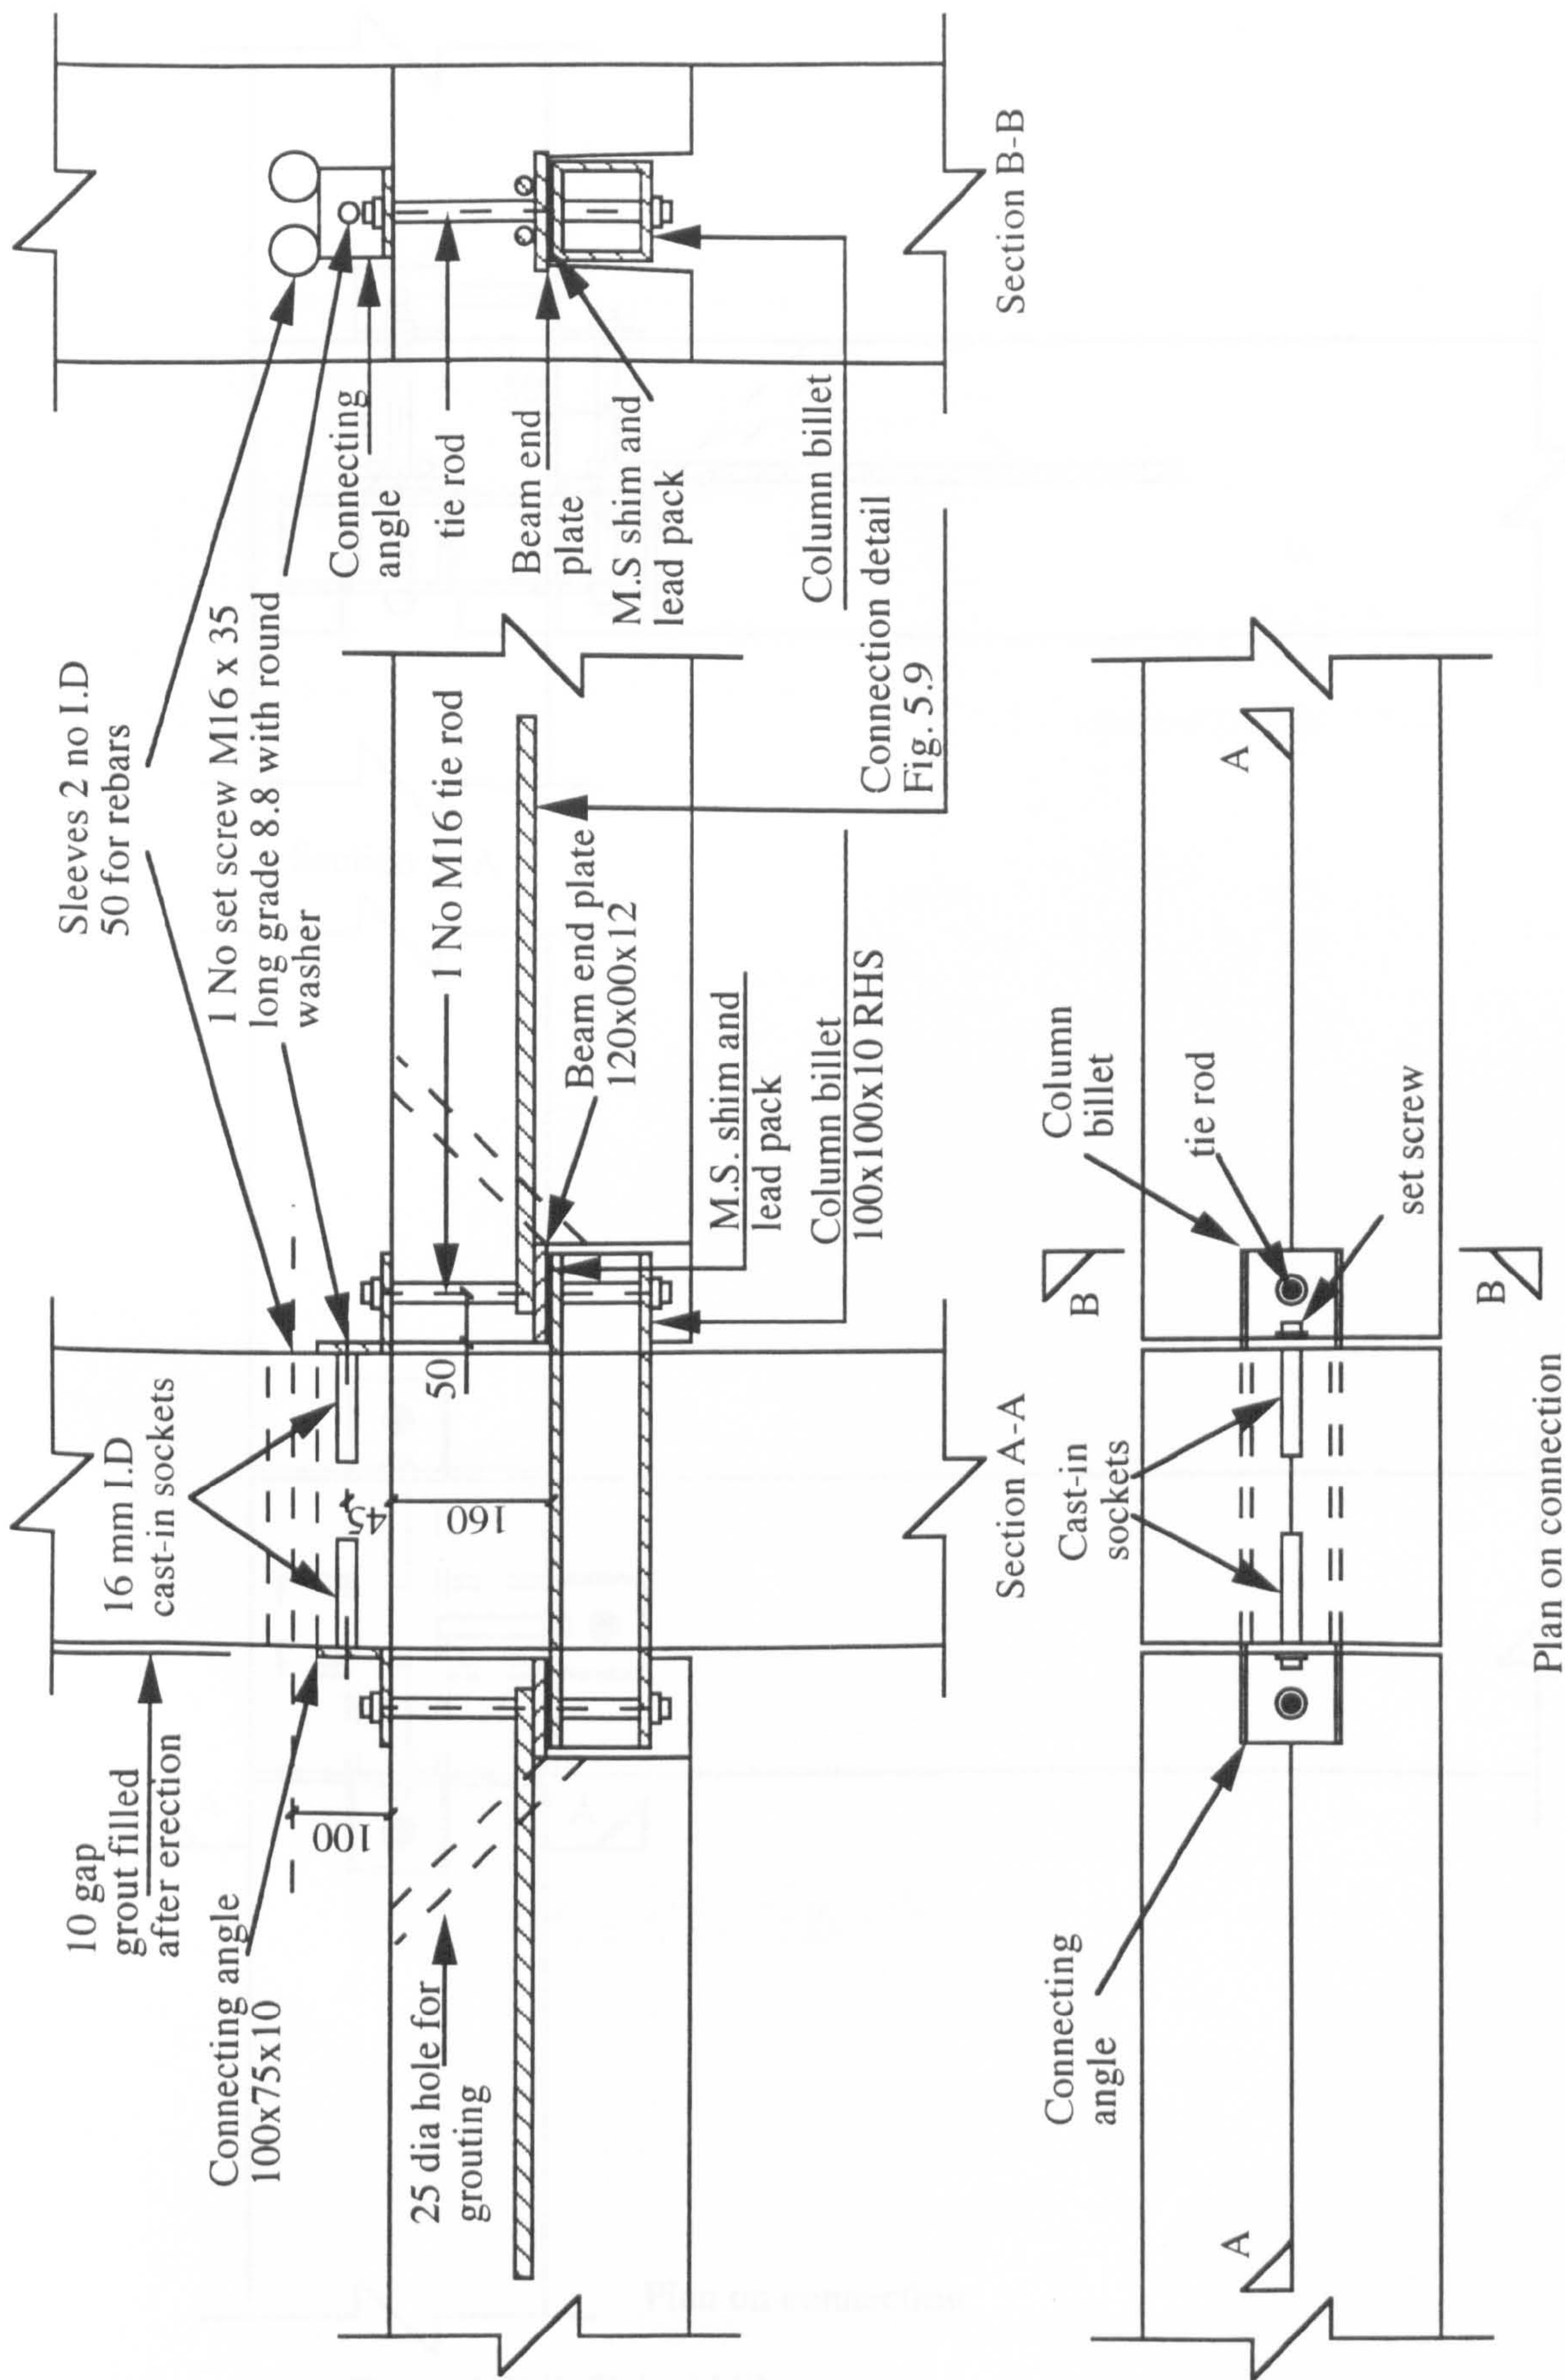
(c): Bolted billet beam-to-column connection (two way connection)
